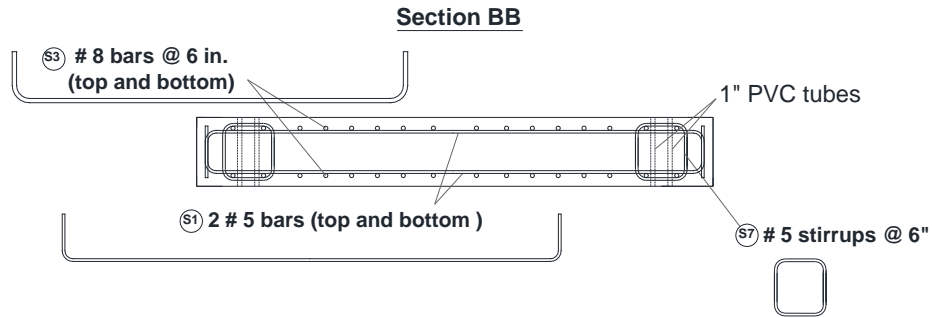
Elevation view of slab reinforcement at Section BB for Specimen #1
